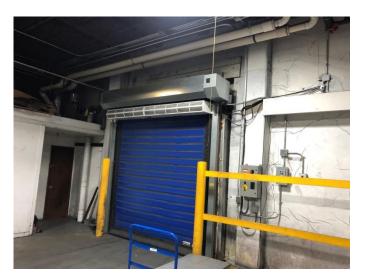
Existing Air Curtain at Rapid Open Freezer Door
